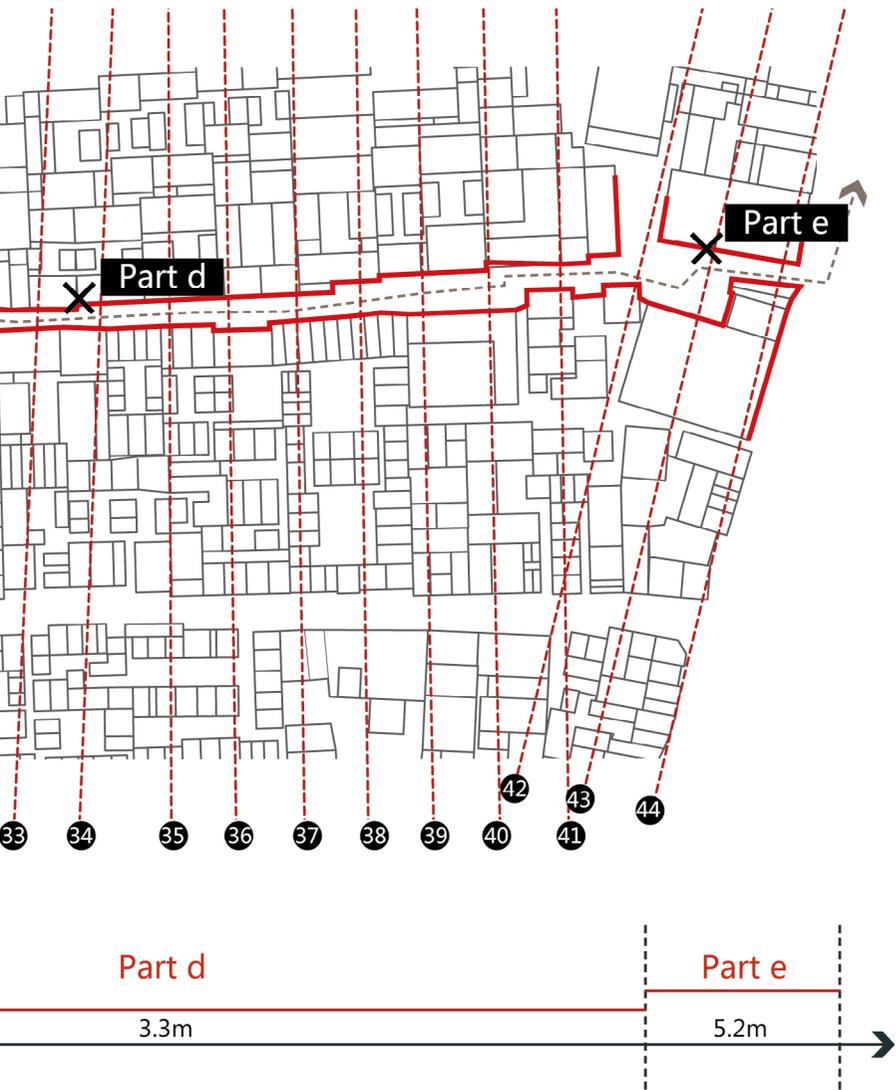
The changing scales in the plan and the sections of Path A
